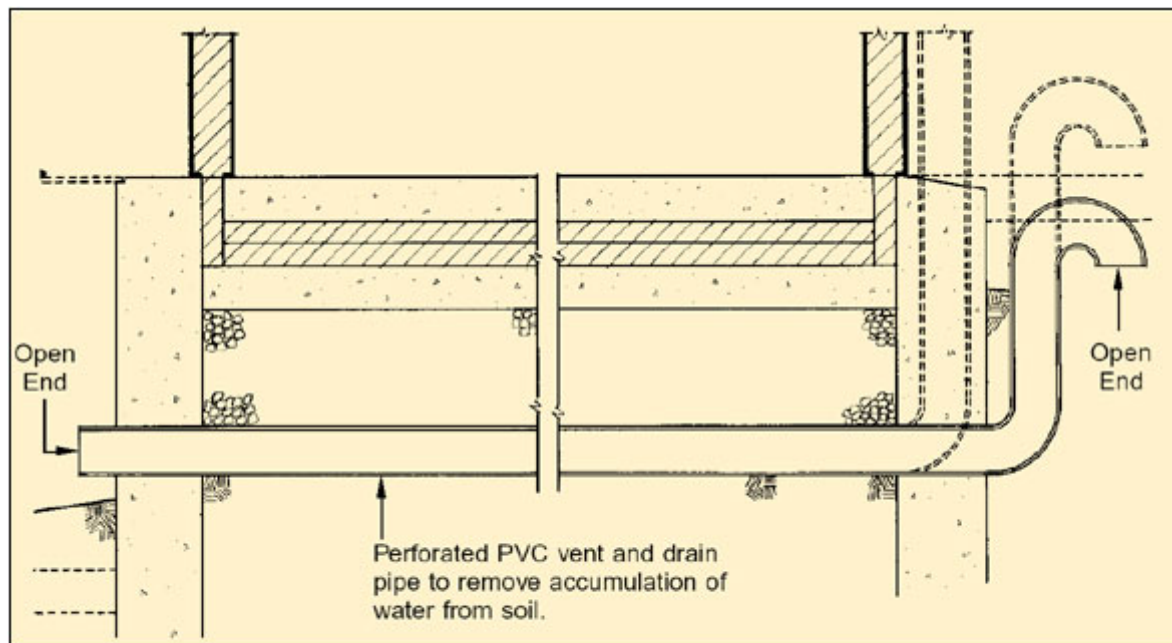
Gravity vent system of PVC pipes installed below a freezer room floor to prevent freezing of sub-soil water. *Courtesy of Bally Inc., USA
